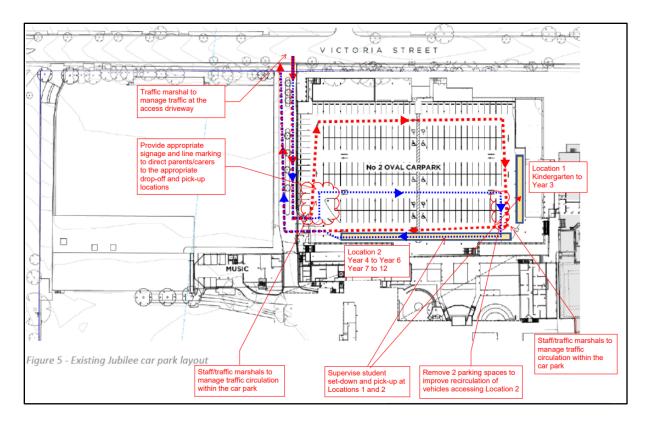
| Interim Management Plan detail (Source: Applicant's Modification Report 2022)
